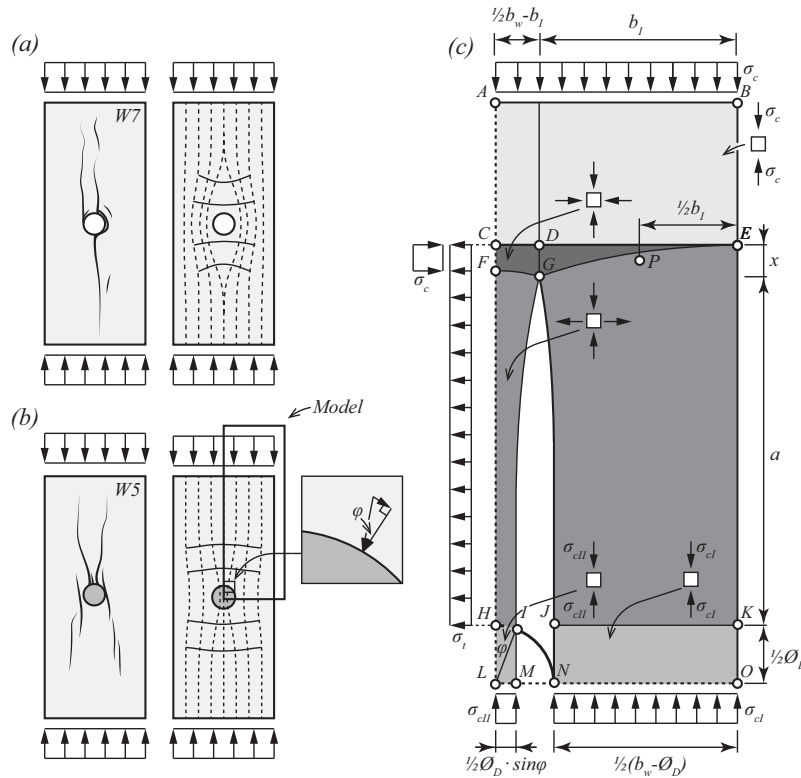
Interaction of structural concrete with prestress ducts: (a) crack pattern and stress flow in a panel with an ungrouted duct; (b) crack pattern and stress flow in a panel with a grouted duct; (c) mechanical model proposed by Hars [41]
